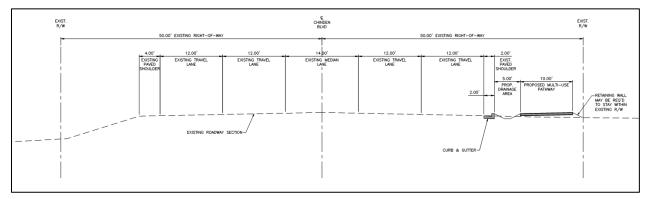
Alternative #1 and Alternative #2, Segment 2 Typical Section
